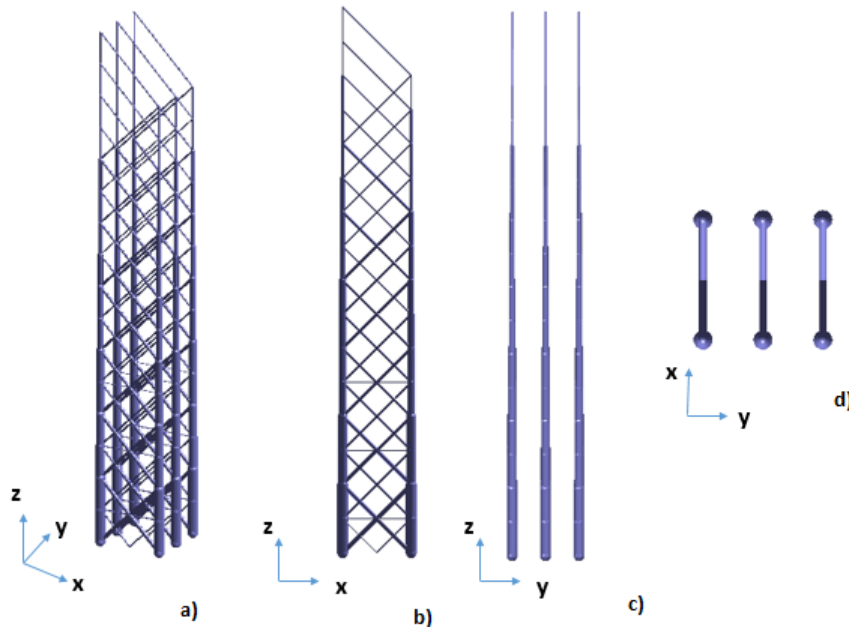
Solutions using the ground structure method: a) 3D view for distributed Load Lvl 1; b) Plan X-Z; c) Plan Y-Z; d) Plan X-Y
